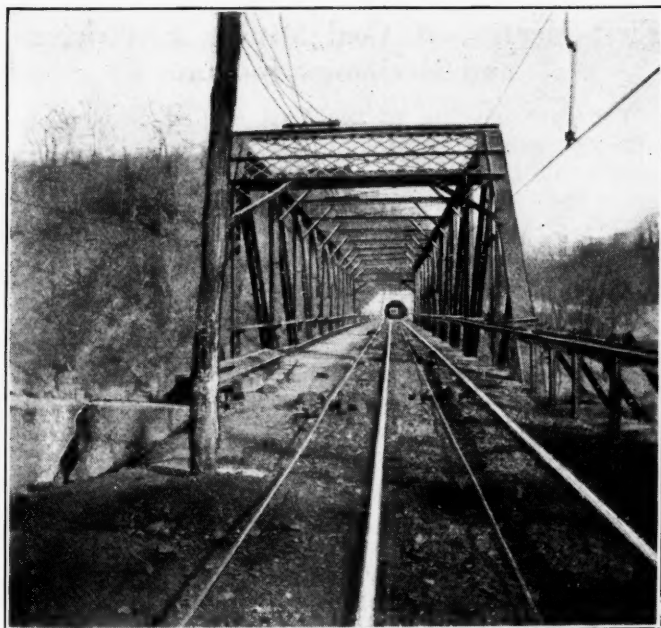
ROPE HAULAGE ROAD AT VESTA NO. 4 PLANT
